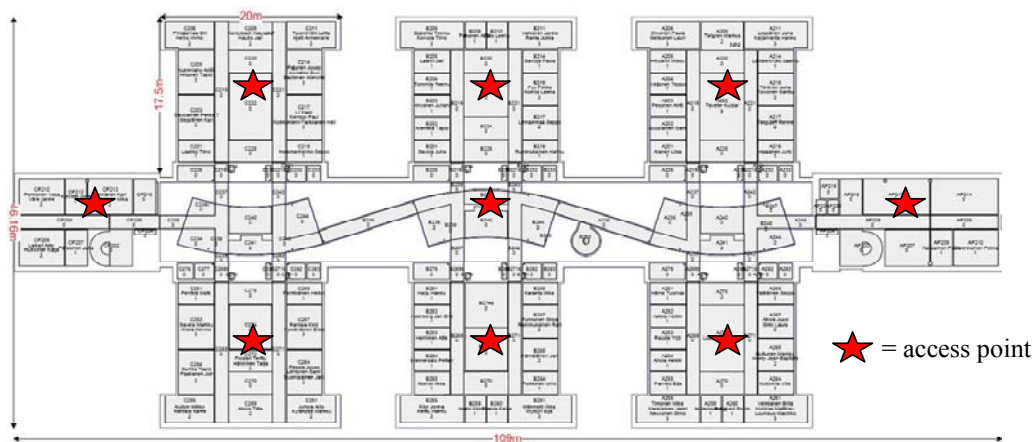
Dimensions of the Digitalo office building and the access point placement.
